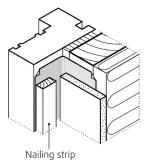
Making the gap between window frame and wall wind tight Strips of wind barrier material and nailing strip
